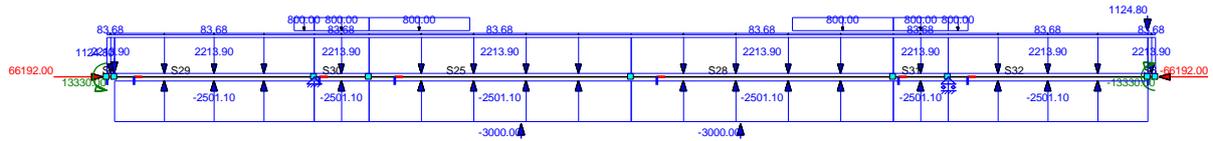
, PRESTRESSING MODEL SET-UP LOAD COMBINATION B
